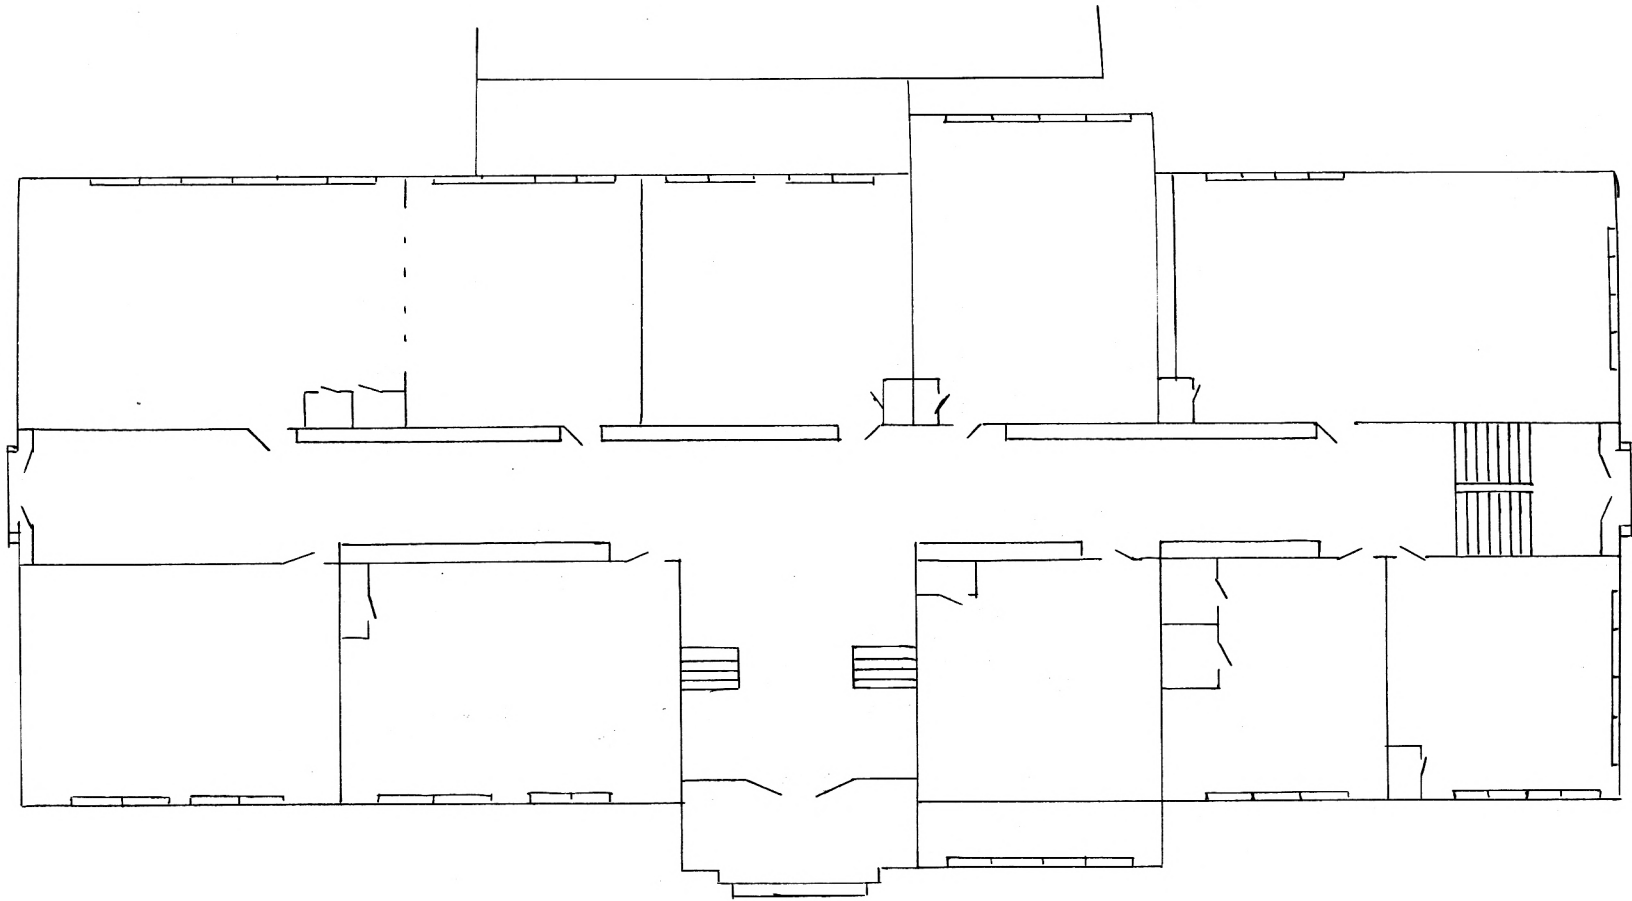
Floor Plans of the first floor. Norton Community High School.
